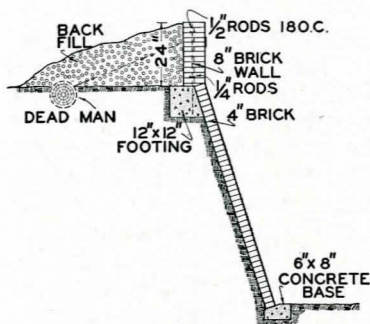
A 4-inch brick wall below grade with 8-inch wall above.
